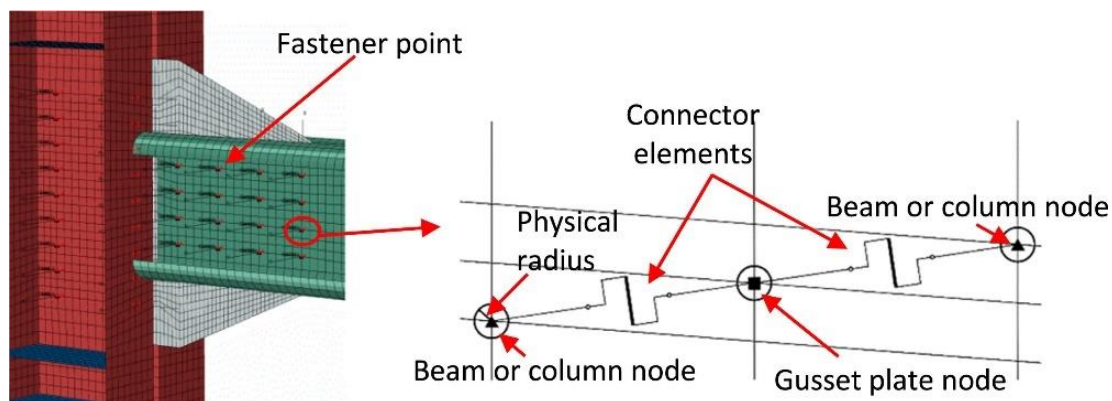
FE model of the beam-column connection with fastener definition (Ye et al., 2020).
